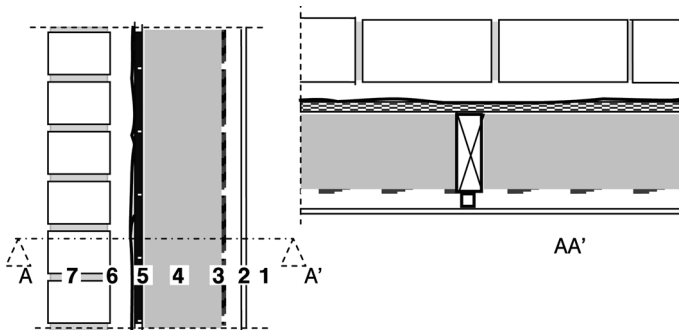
Timber-framed outer wall, reference assembly (1: inside lining, 2: service cavity, 3: air and vapour retarder, 4: thermal insulation; 5: sheathing, 6: building paper, 7: outside finish).
